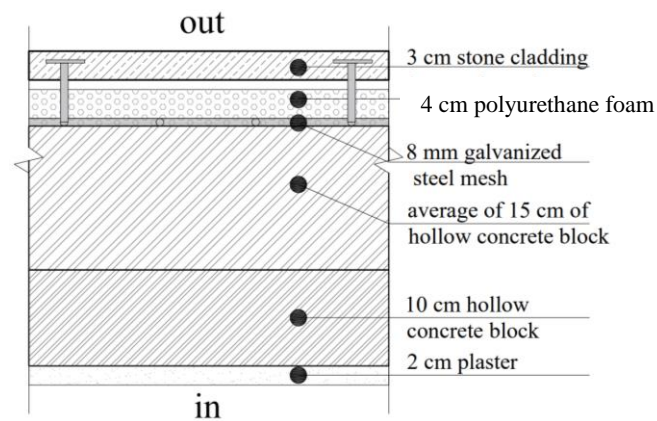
Trial 14, outer installation of PU foam on hollow block wall composite
